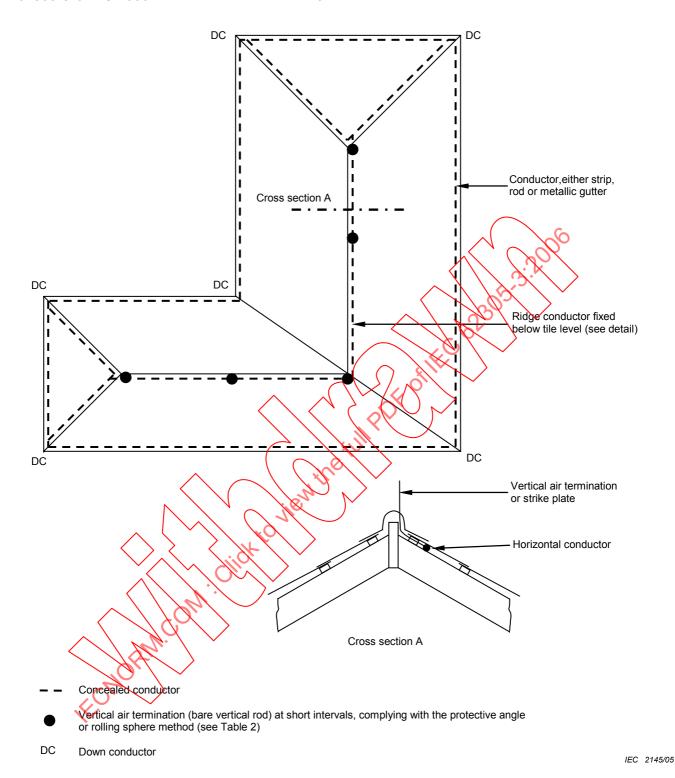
Air-termination and visually concealed conductors for buildings less than 20 m high, with sloping roofs
